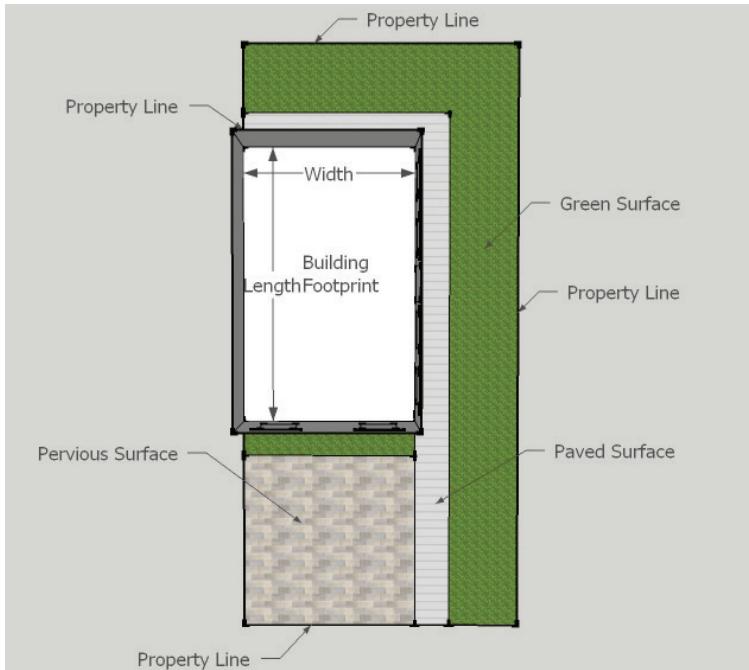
Building footprint measurement for rainwater collecting storage computation
